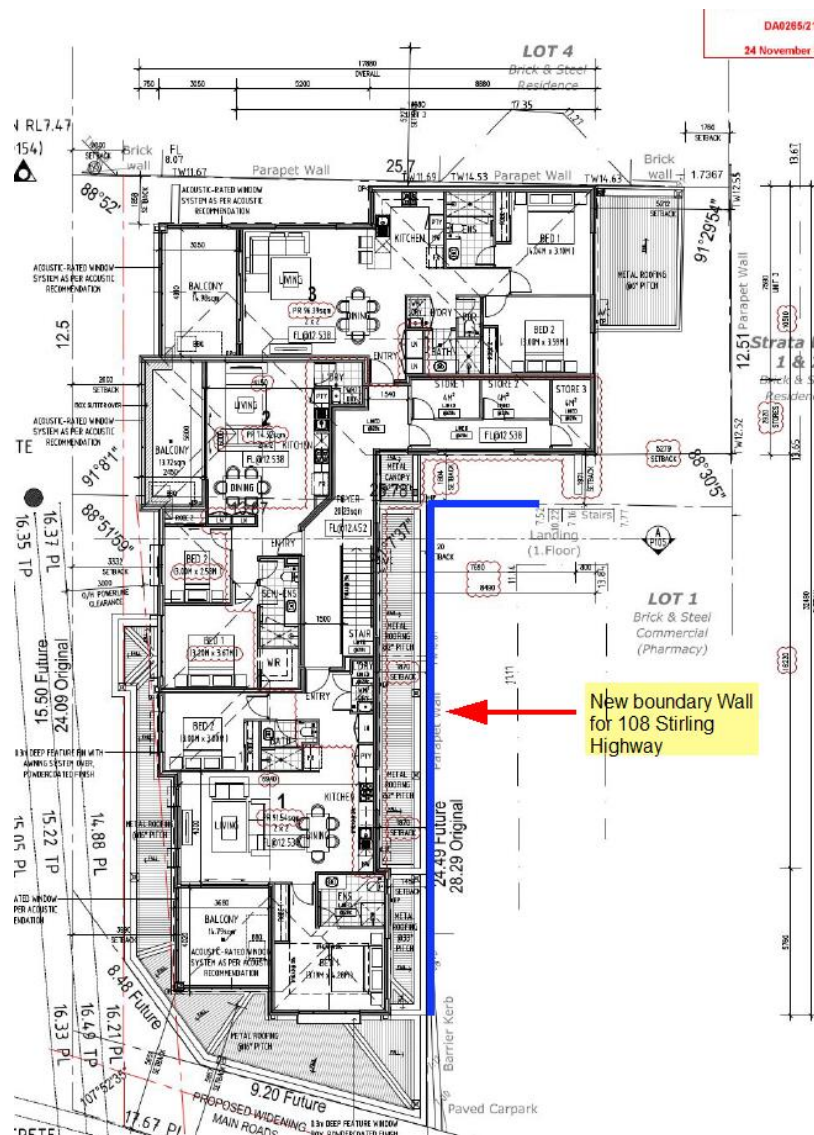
Eastern boundary wall for 108 (shown in blue lining on plan) Stirling Highway shown on proposed plans for 110 Stirling Highway upper floor plans
